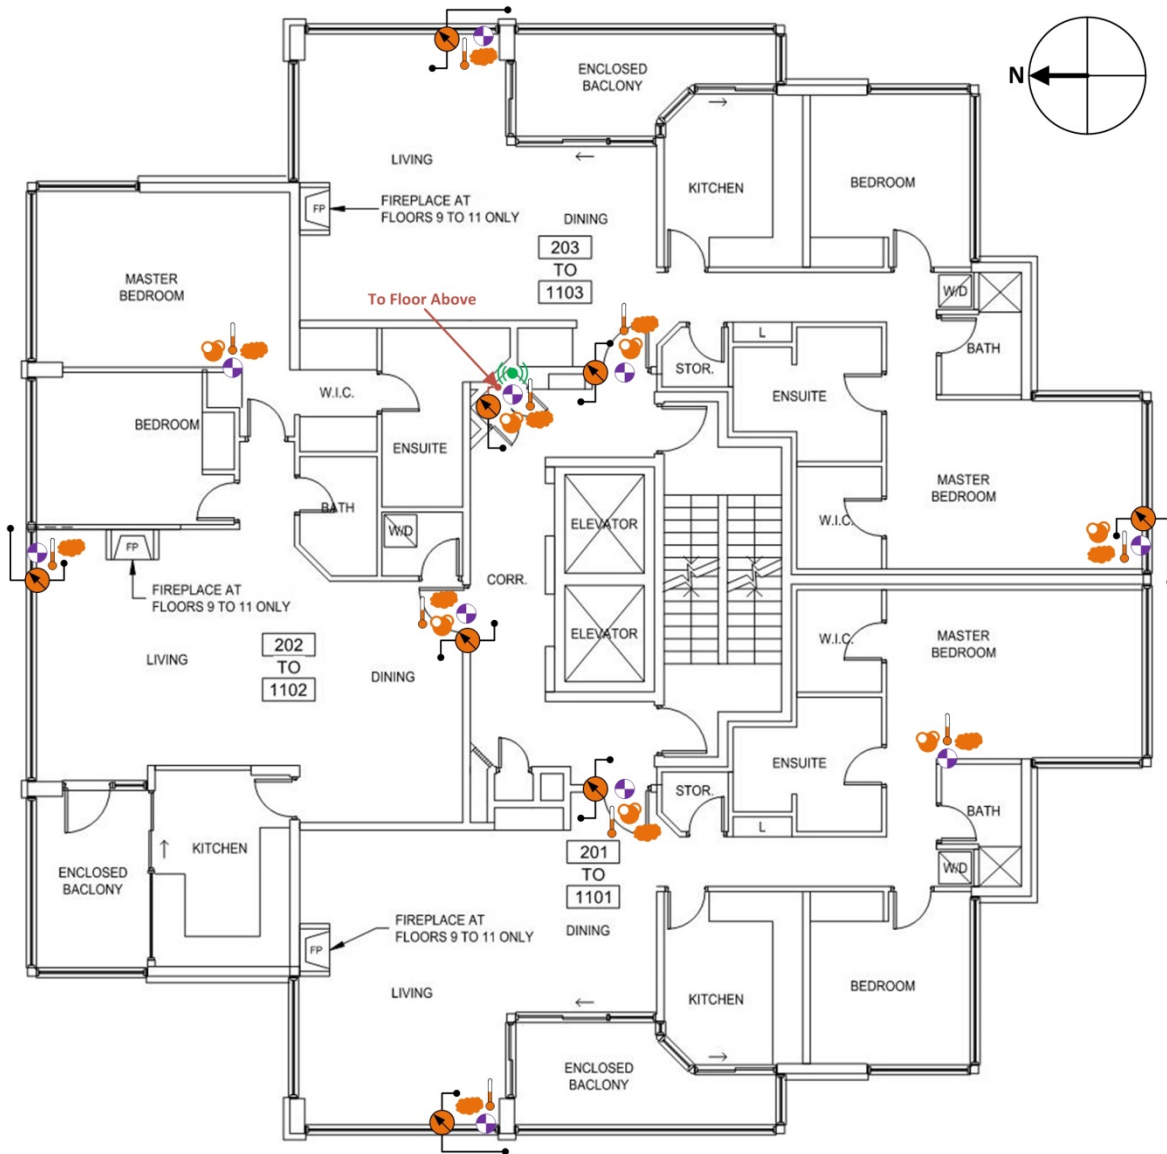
Floor plan showing layout of monitoring equipment for Floors 3 and 11
